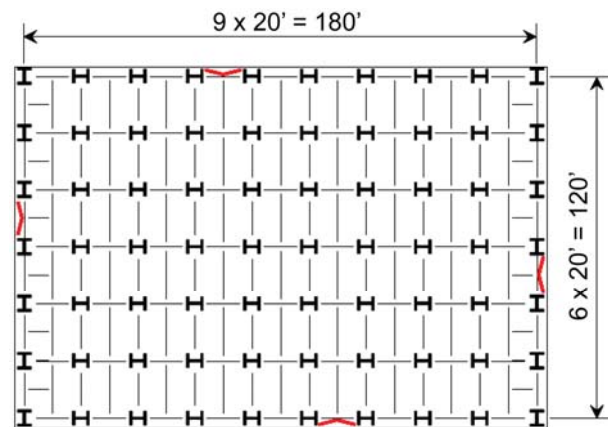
Plan configuration of 2-story braced frame archetypes.
